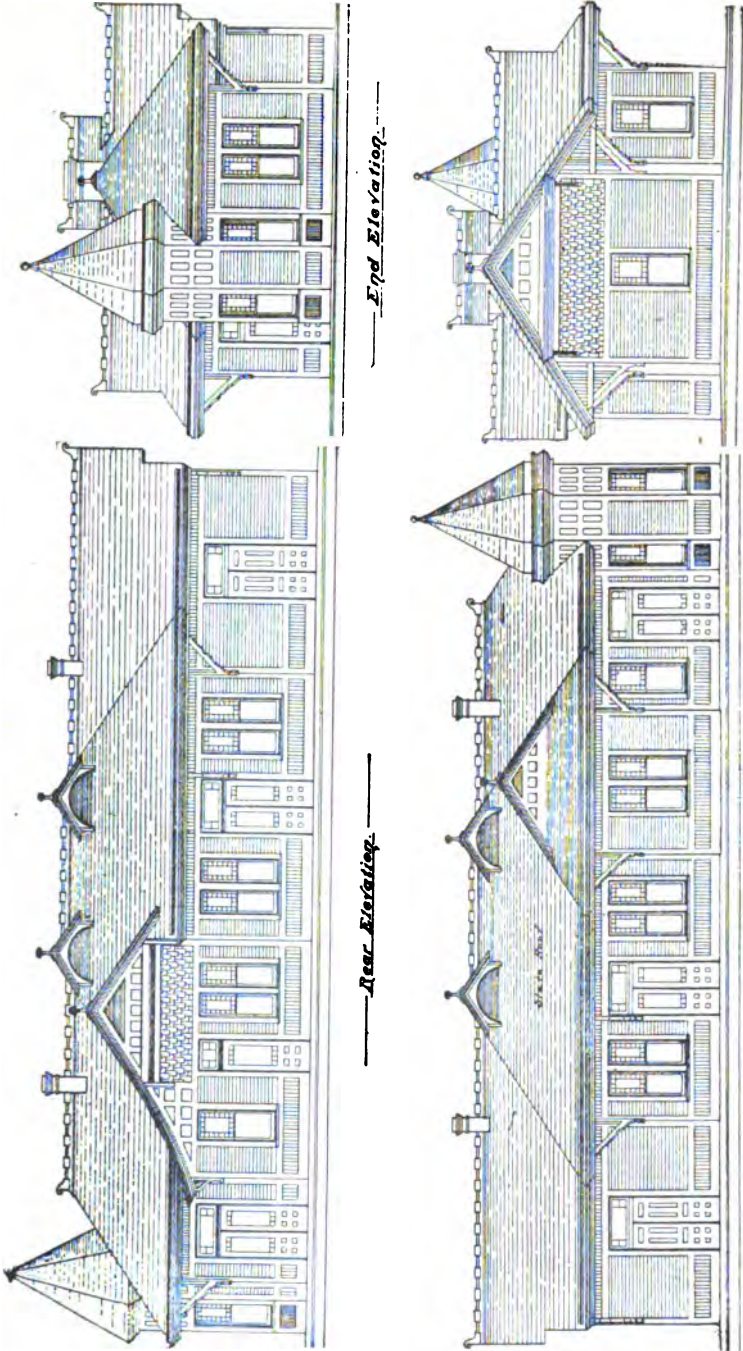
ELEVATIONS OF LOCAL PASSENGER DEPOT AT RICHMOND, KY., LOUISVILLE AND NASHVILLE R. R.
